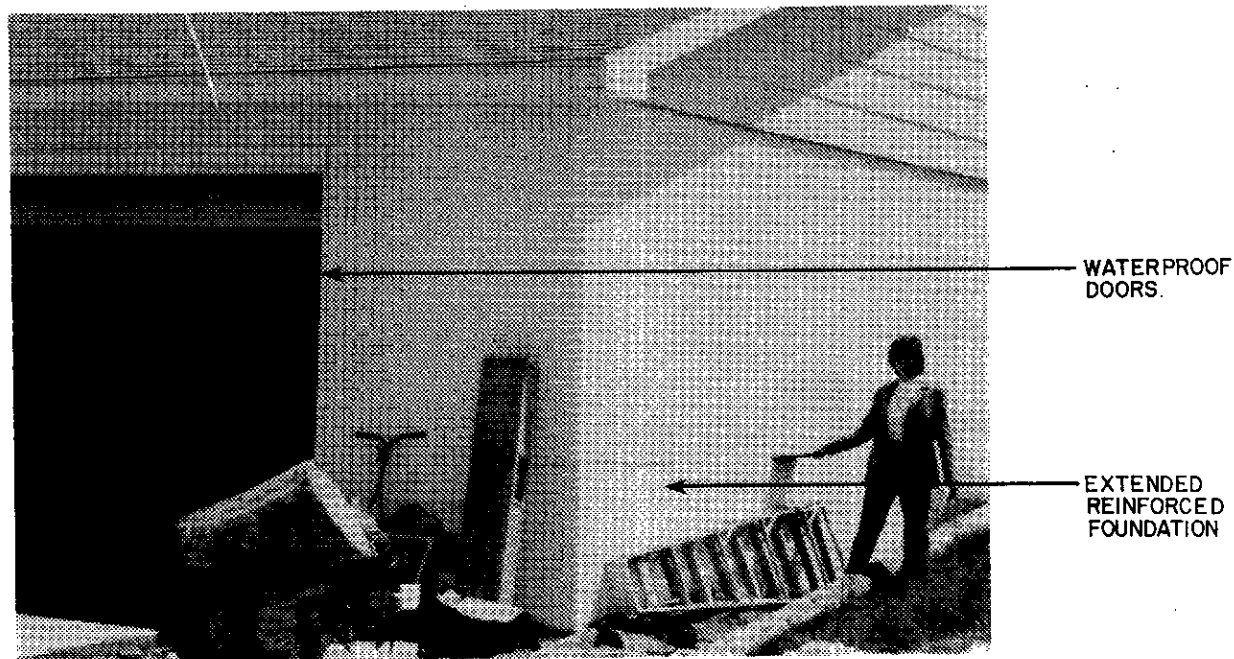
Small motor and lawnmower repair shop under construction. Floodproofed to an elevation of 6 feet. Doors will be fitted with rubberized seals.
